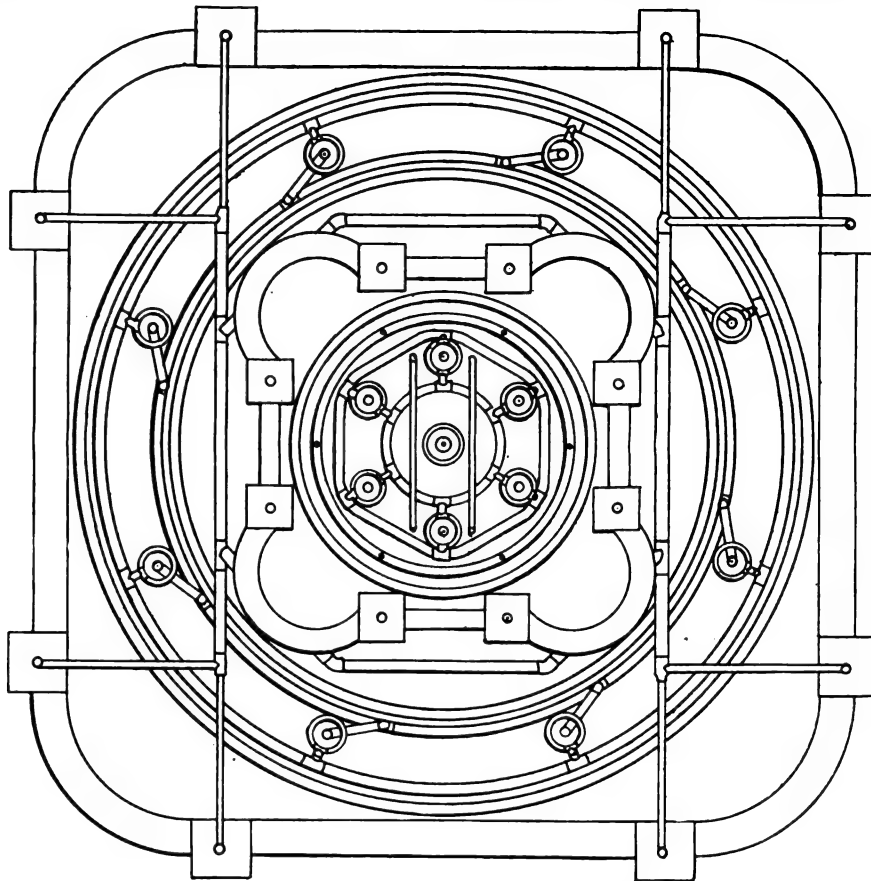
PLAN OF FOUNTAIN, SHOWING PIPING.
